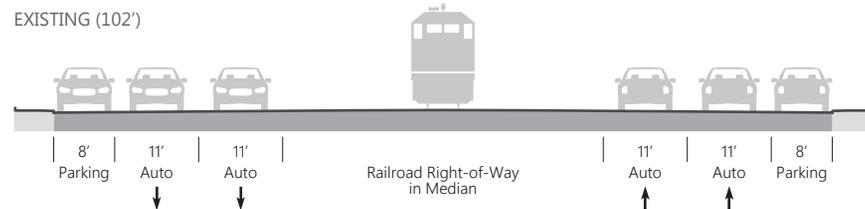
RANDOLPH STREET EXISTING CROSS-SECTION
